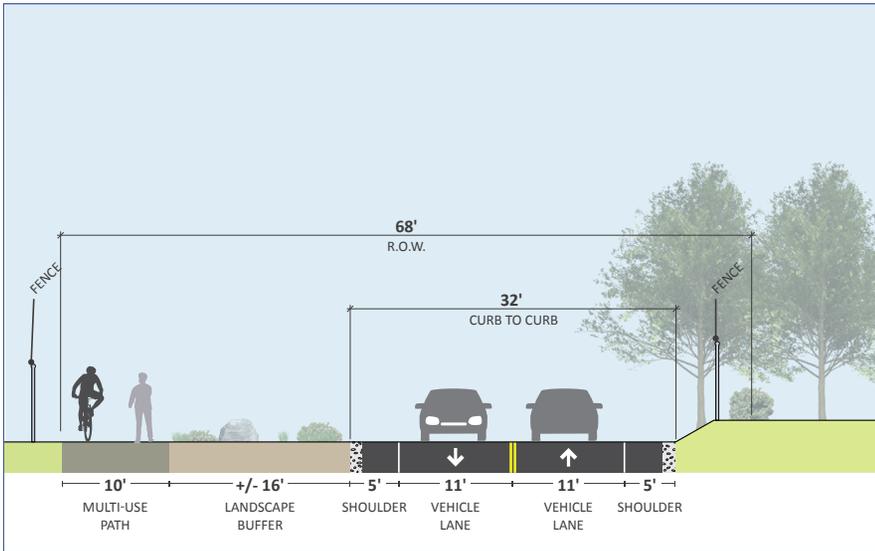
Existing Street Section of Magnolia Road (looking east)
